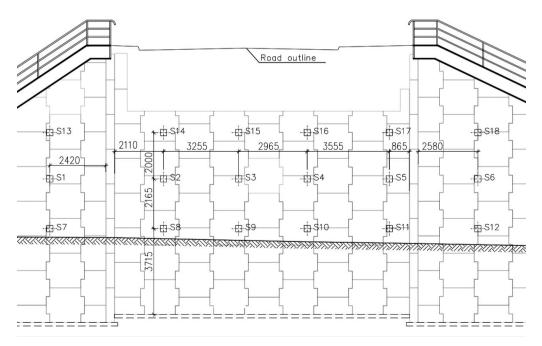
Arrangement of control points on front wall and wings of reinforced earth abutment
